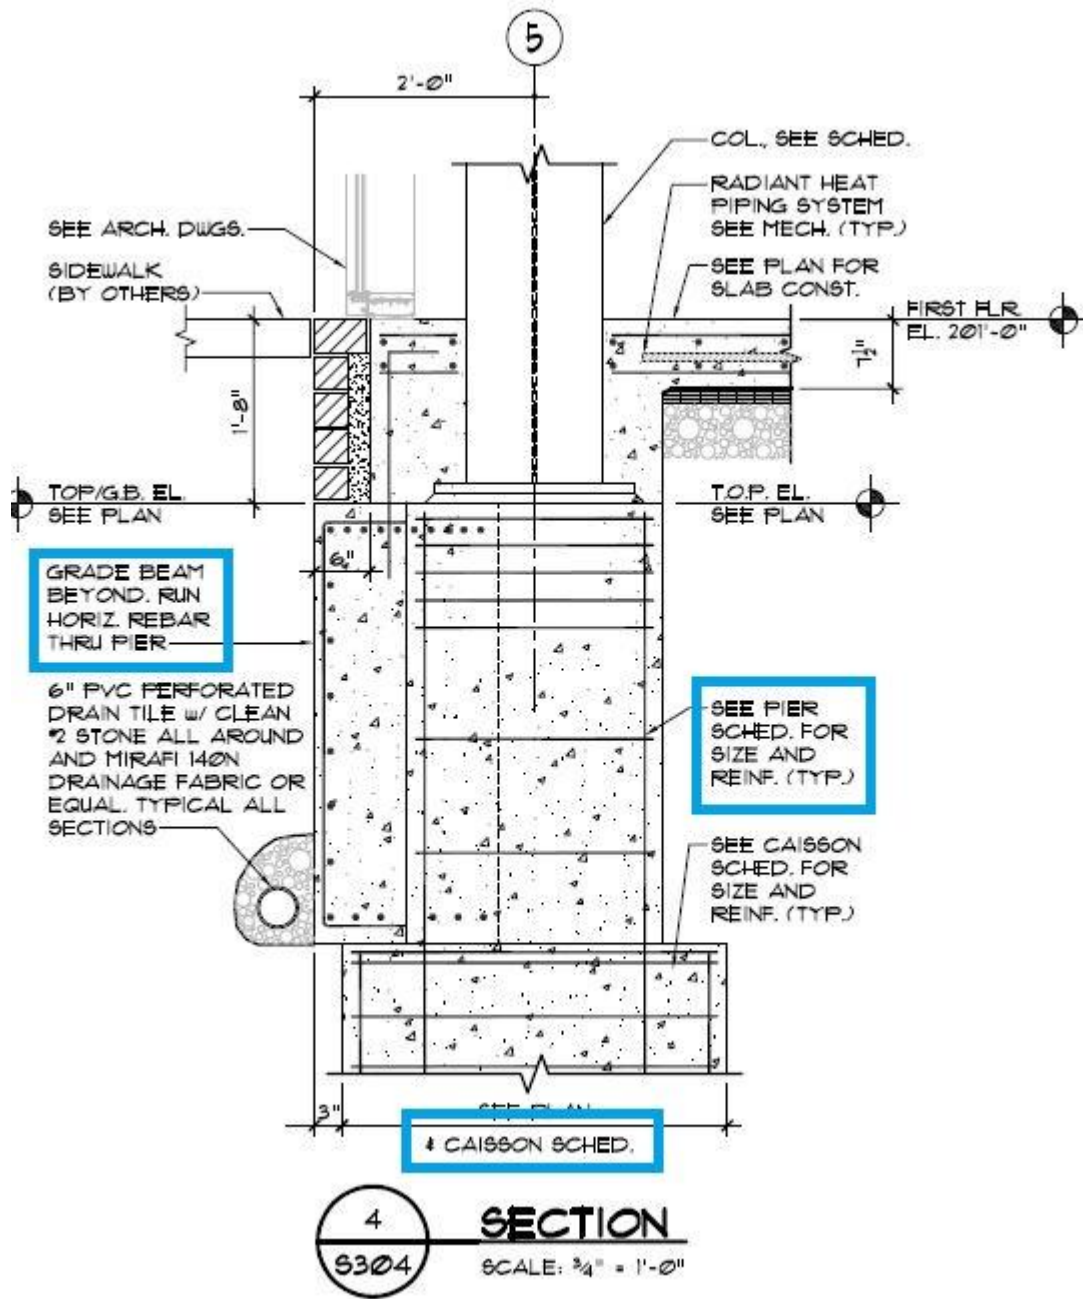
A section cut of a drilled caisson foundation. Courtesy of Highland Associates
